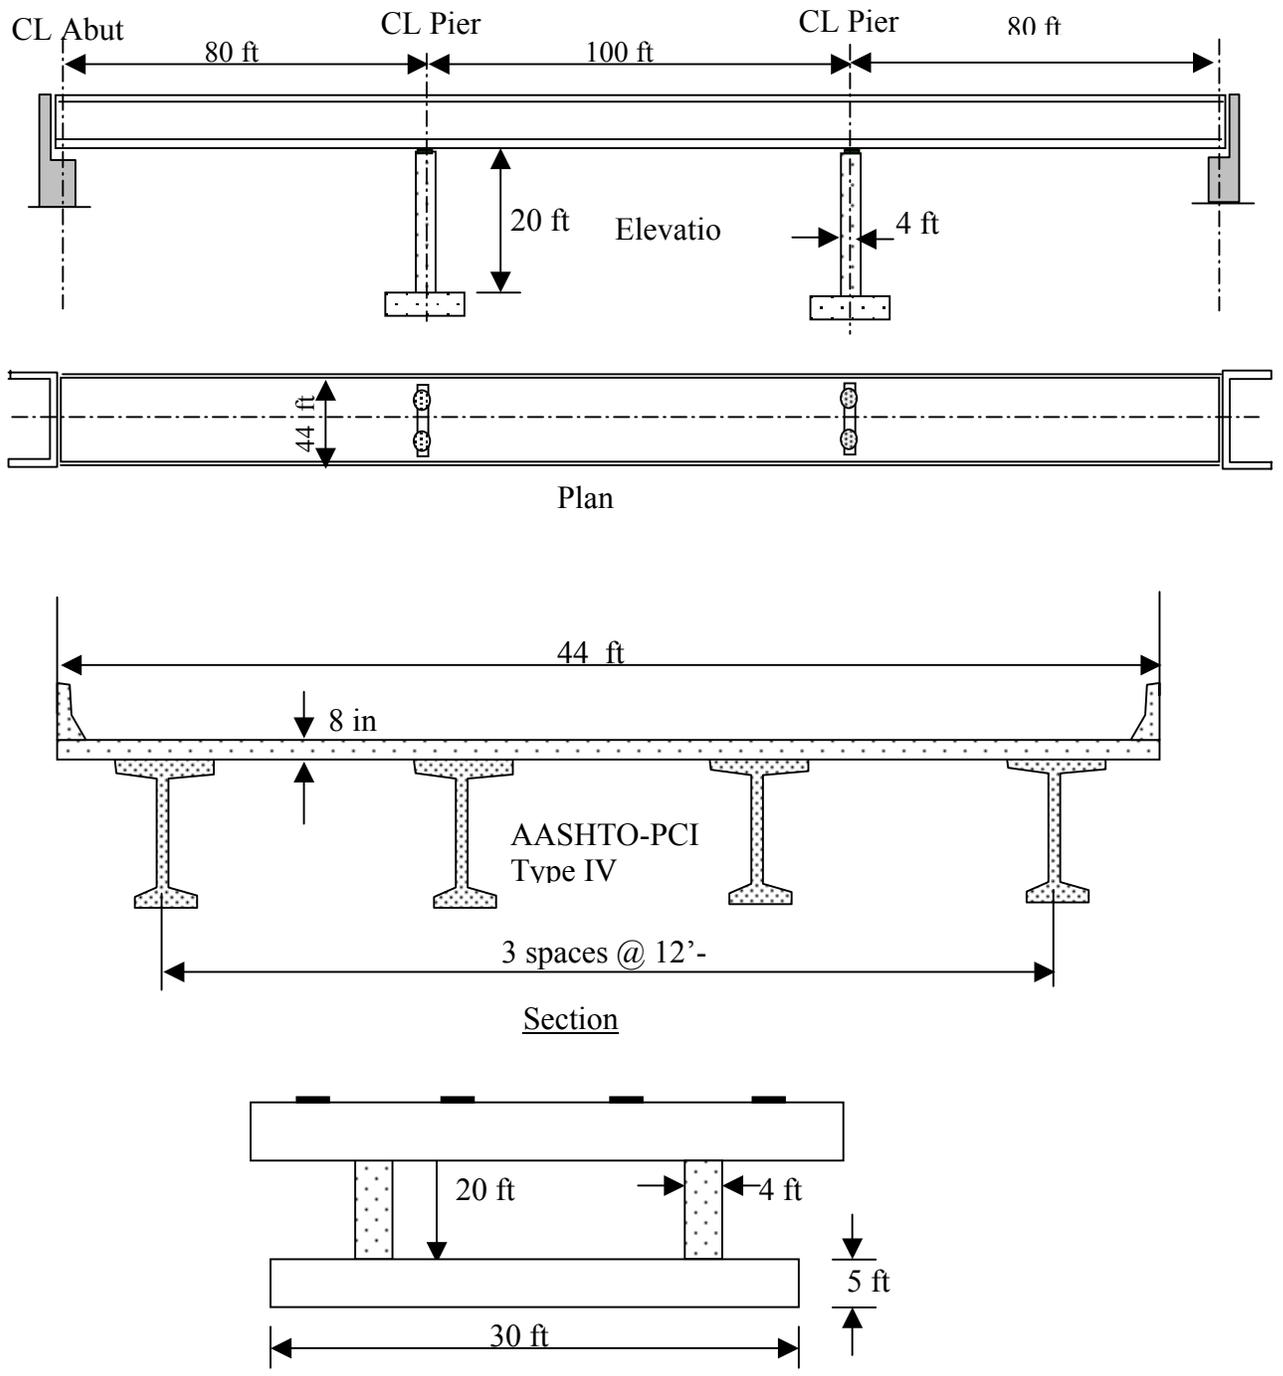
Plan, elevation, and sections of seat-type abutment example.
